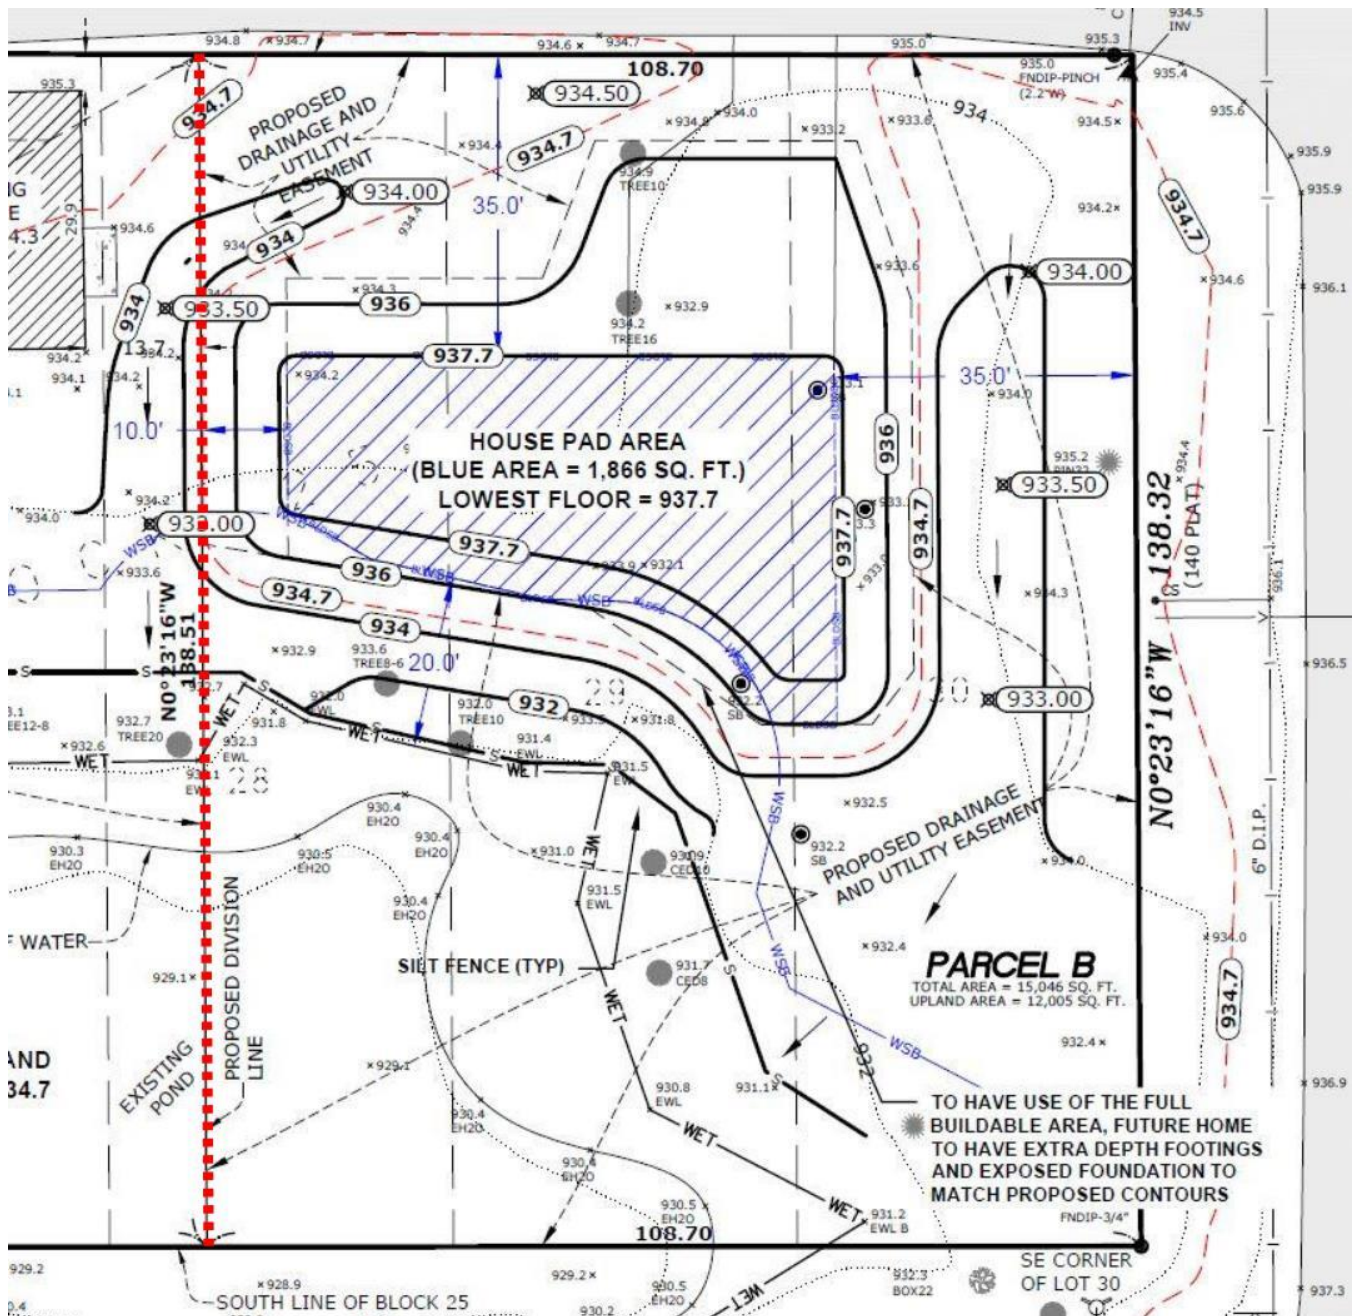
Excerpt from applicant's submittal, showing proposed grading and elevations. The proposed house pad area for Parcel B is shown in blue. Proposed lot split line is shown in red.
